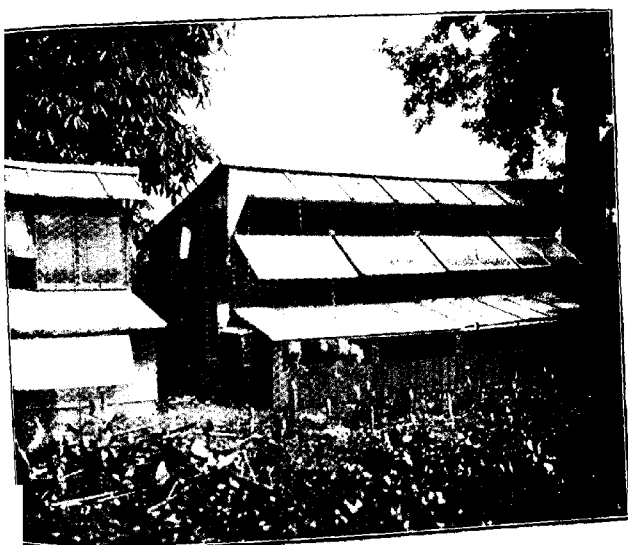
Poultry House constructed of Bituminous Felt on a wooden frame.
